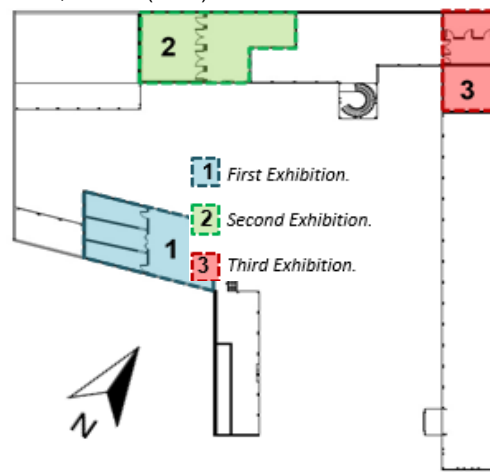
First Floor Plan for Bait Obaid Al-Shamesi museum by Revit. (Source: Author, 2016).
